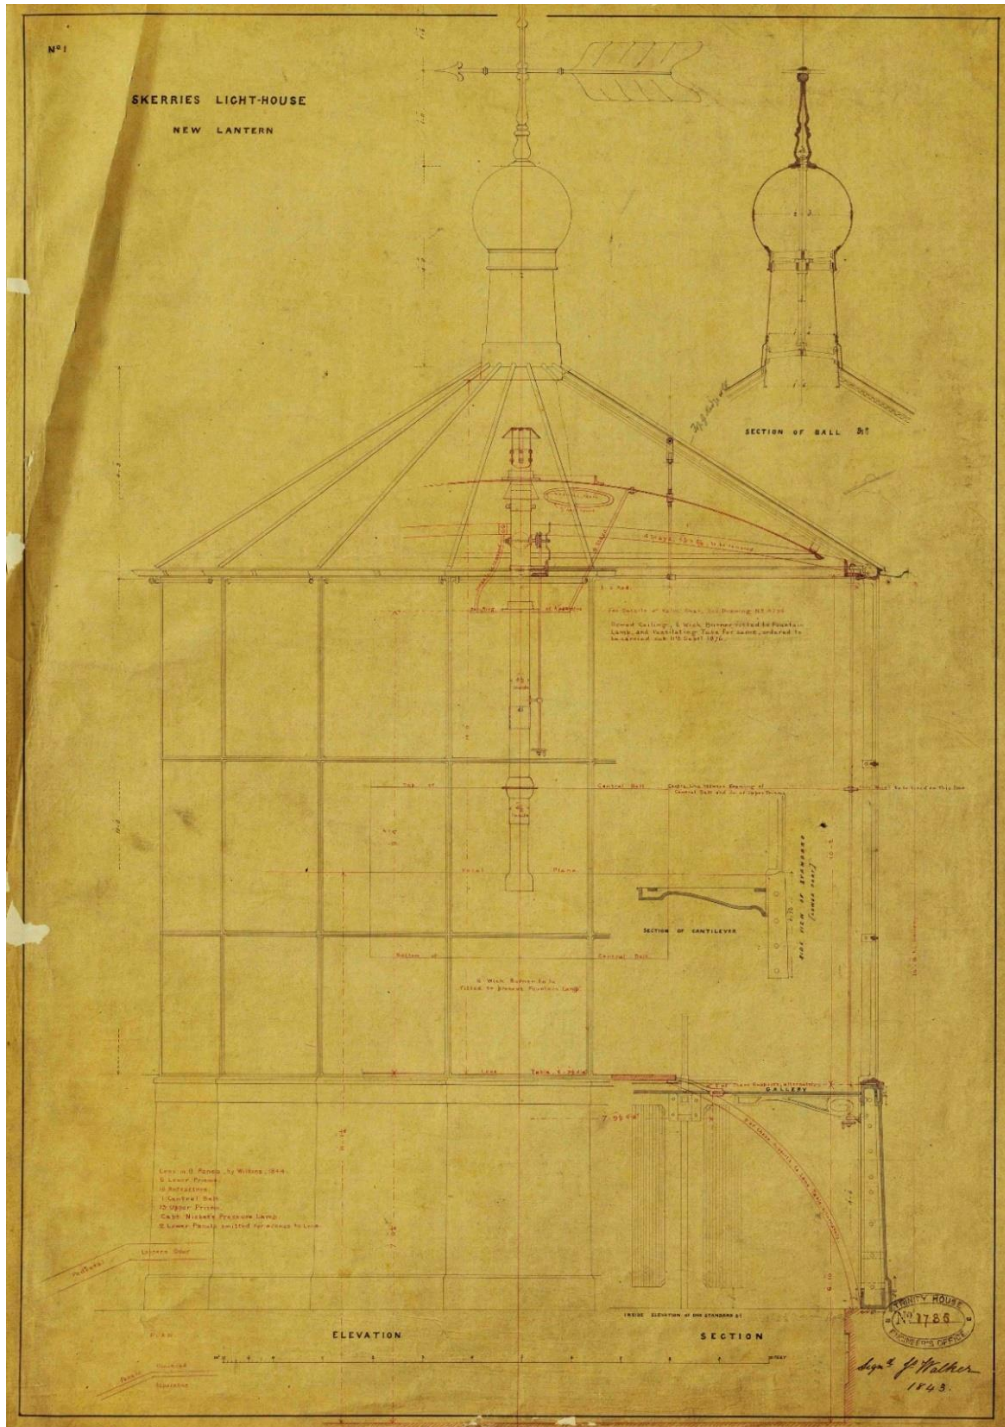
Drawing, dated to 1843, for a new lantern room at the Skerries Lighthouse (image courtesy of Trinity House Archive. Drawing No. 1785).
